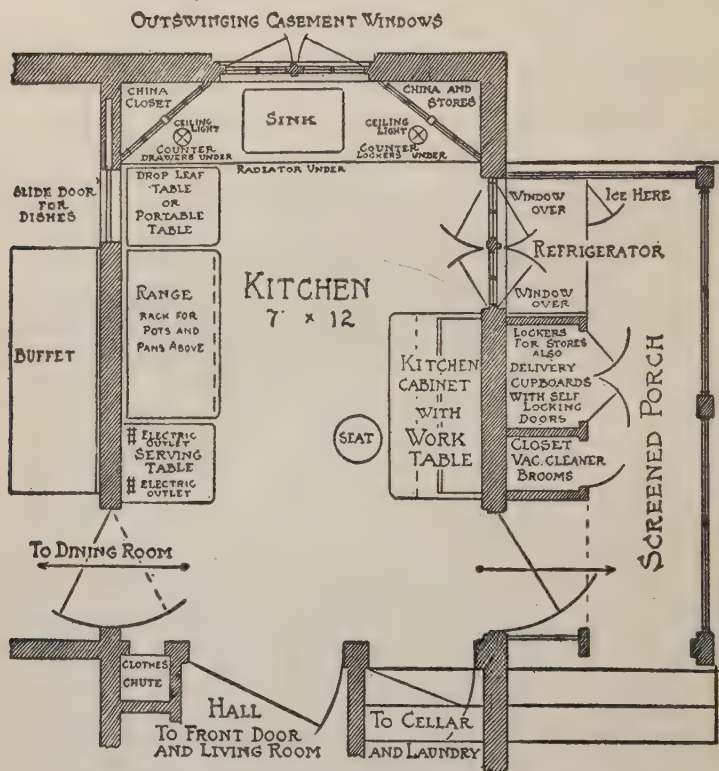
Floor Plan of the One Woman-Power Kitchen
